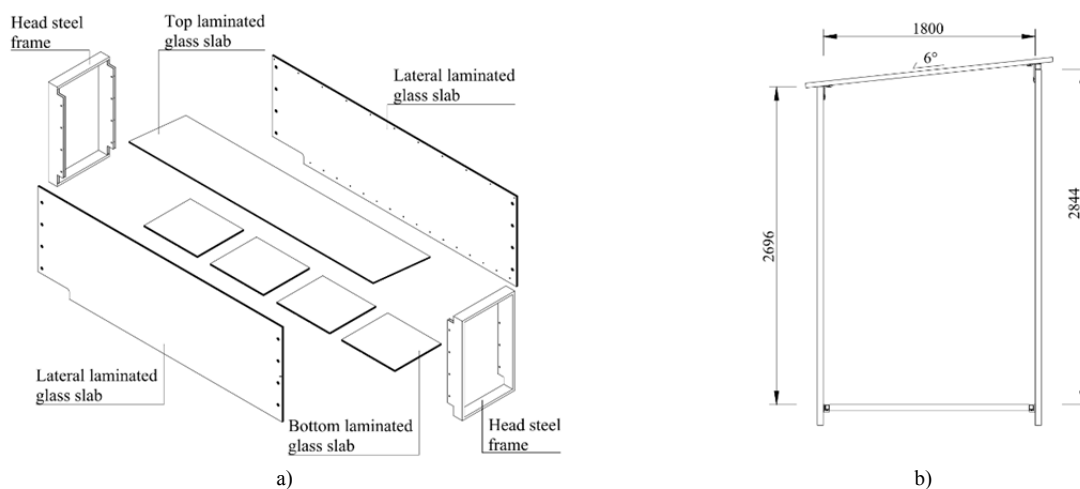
Exploded view and b) cross-section of the glass walkway.
